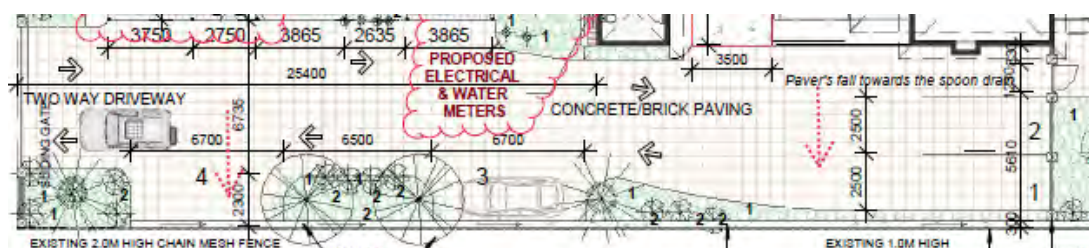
Amended plans addressing Condition Precedent 1, submitted for endorsement and showing changes to driveway surfacing, Drawing No. A02, prepared by Steve Adler Building Design, dated 27/09/2018
